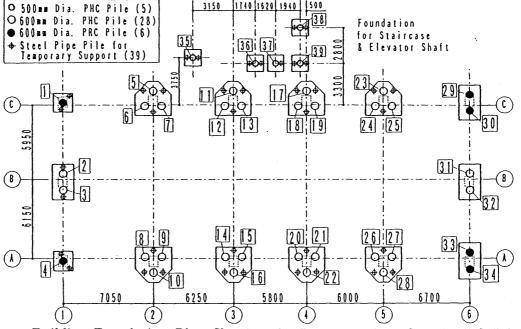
Building Foundation Plan Showing the Location of PHC and PRC Piles and Footings. The Crossed Circles Show Location of Steel Pipe Piles for underpinning.
